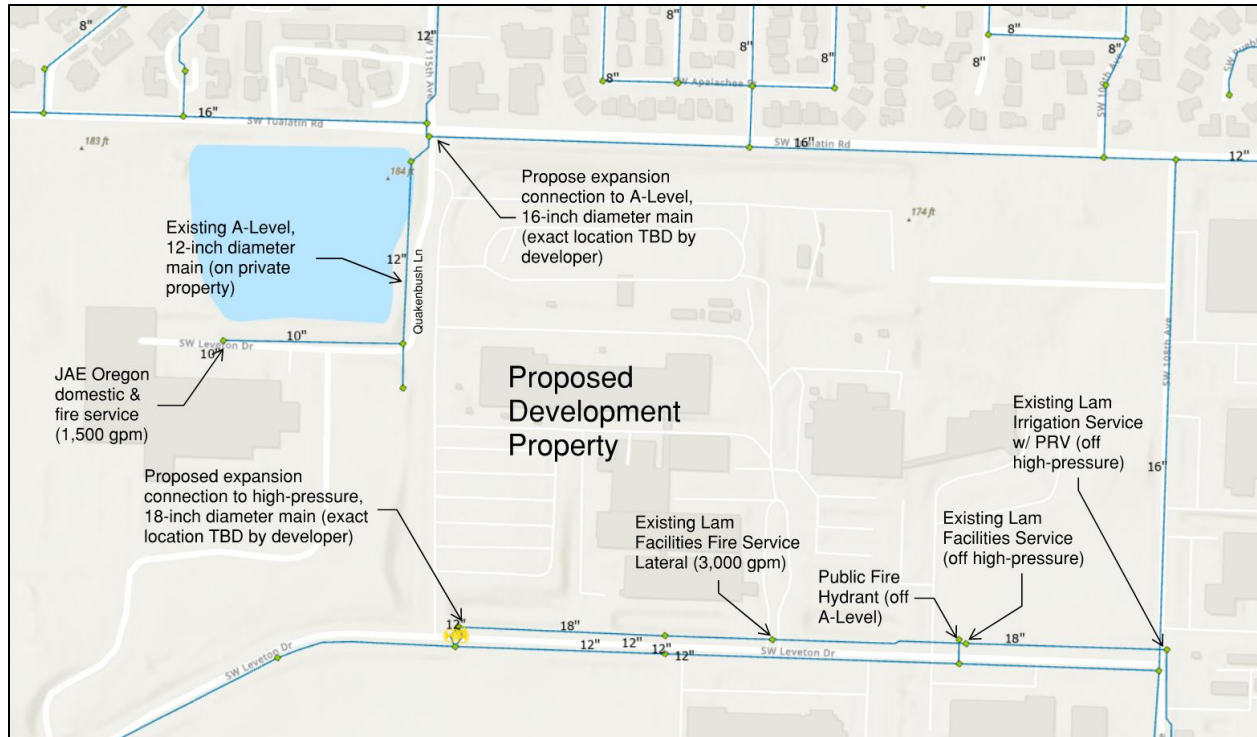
Proposed Development Site and Existing Water System Infrastructure
